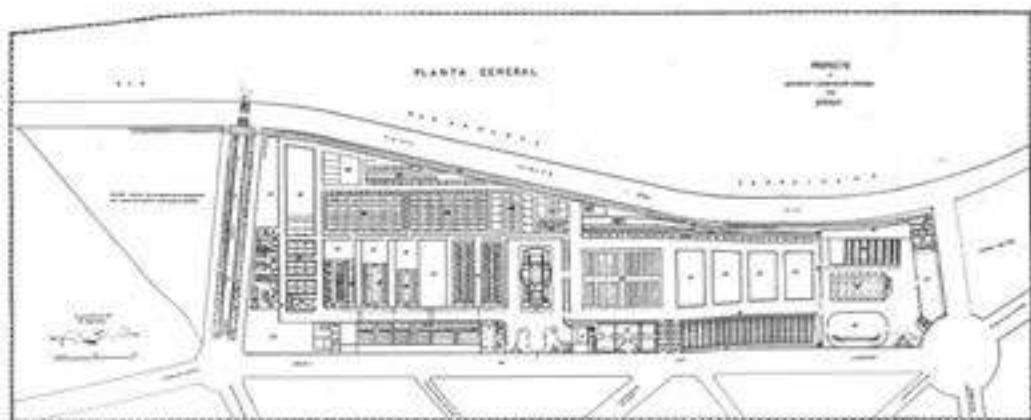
Floor plan of the *Nuevo Matadero y Mercado de Ganados de Madrid* project, 1914.
